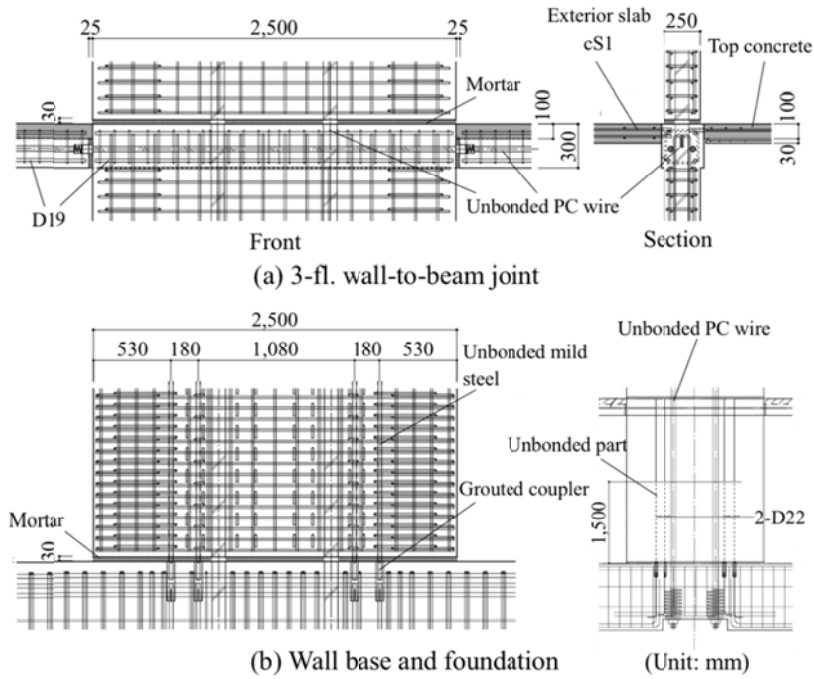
Reinforcement details of walls (Unit: mm)
